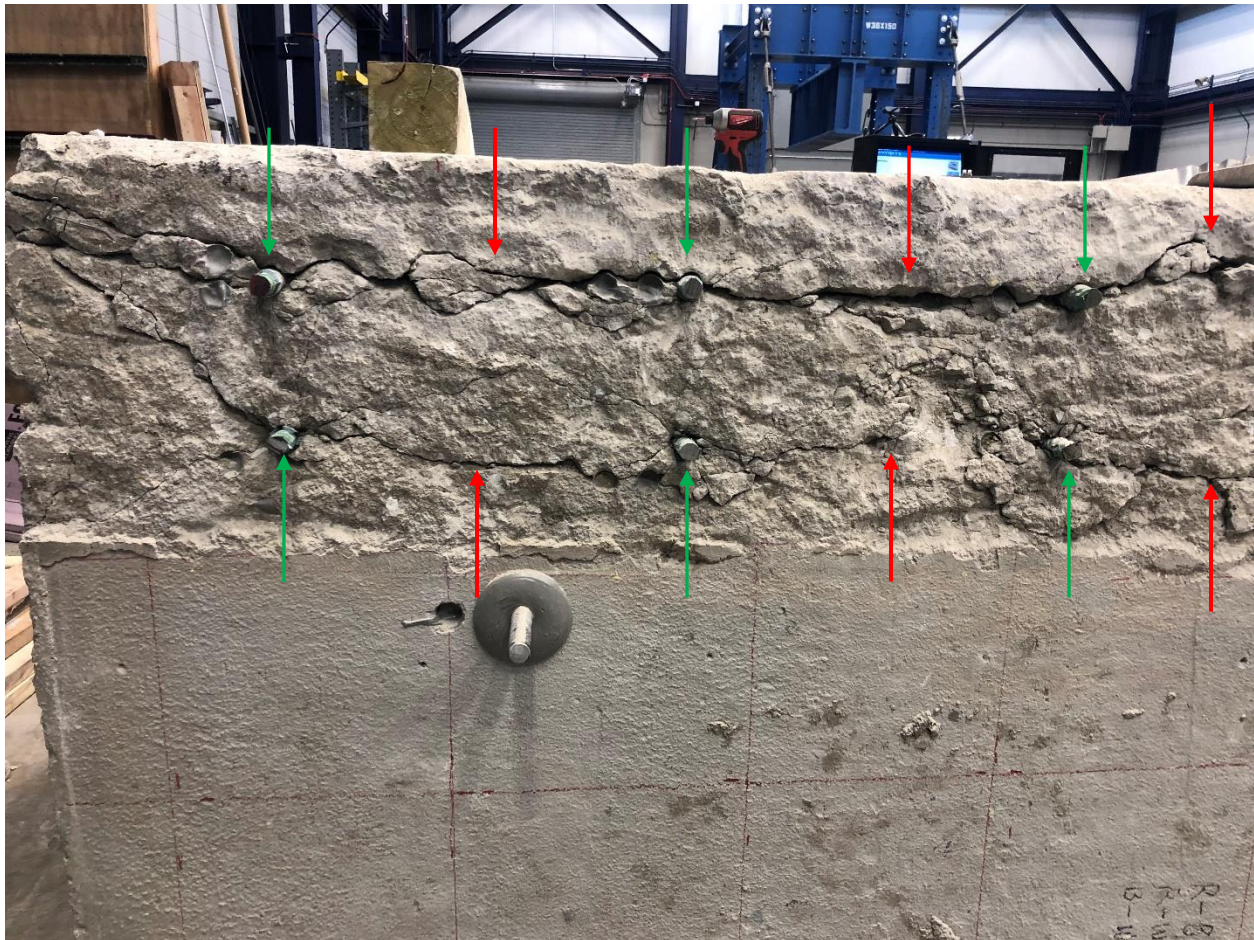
Test Sample B1. Green arrows point to the reinforcement anchors. Red arrows point to cracks between a row of anchors.
